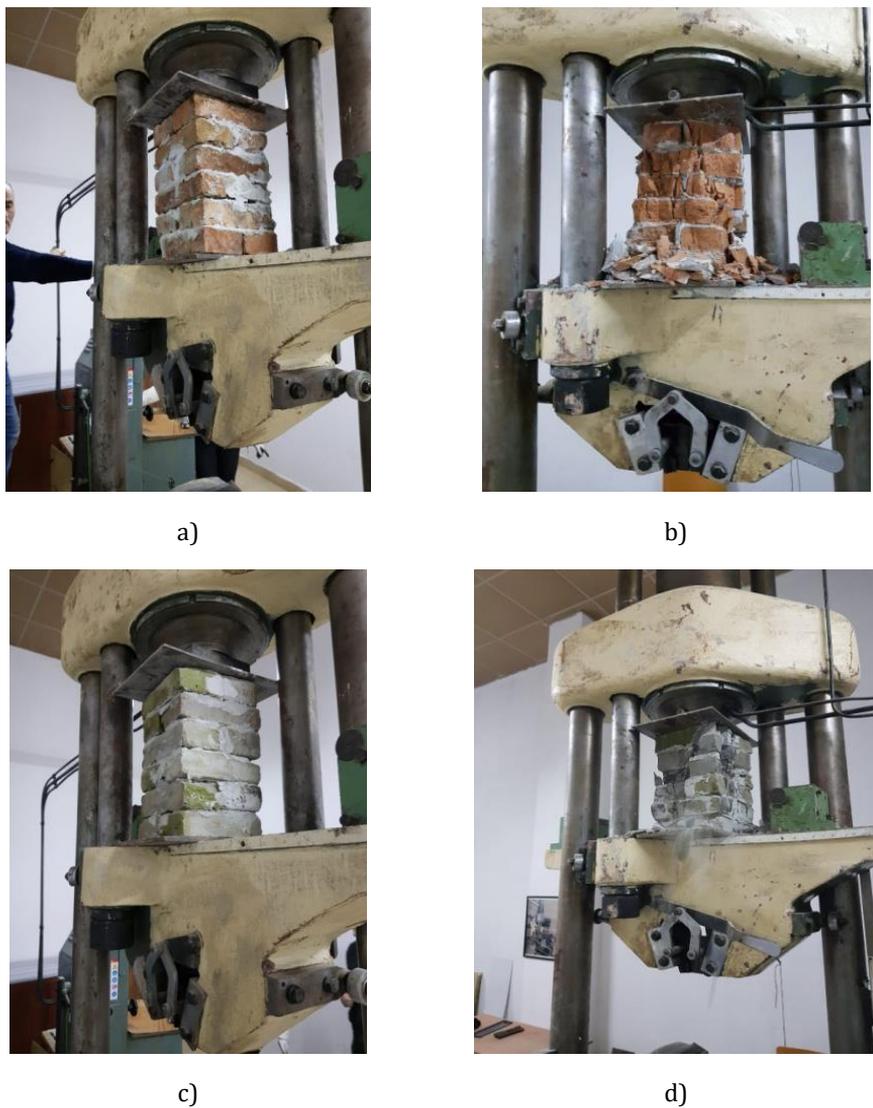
Masonry prism tests (a-b); Red clay brick samples under compression and silicate brick test (c-d)
